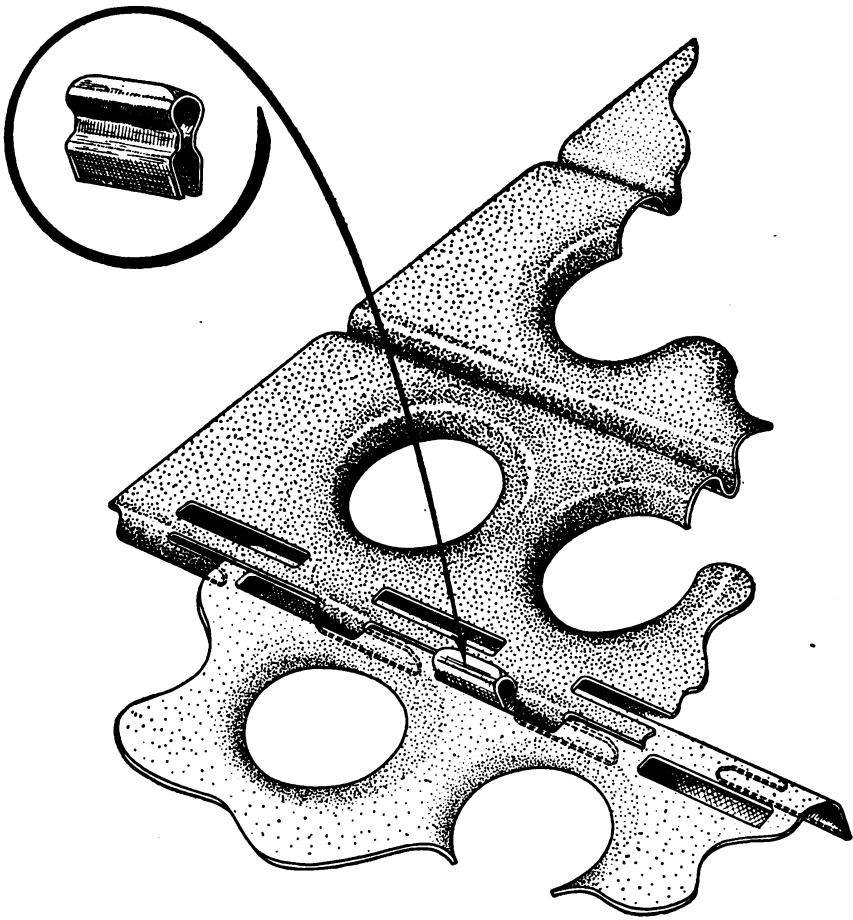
Details of bayonet-hook joint of pierced plan. Spring clip in second slot from end of panel.
